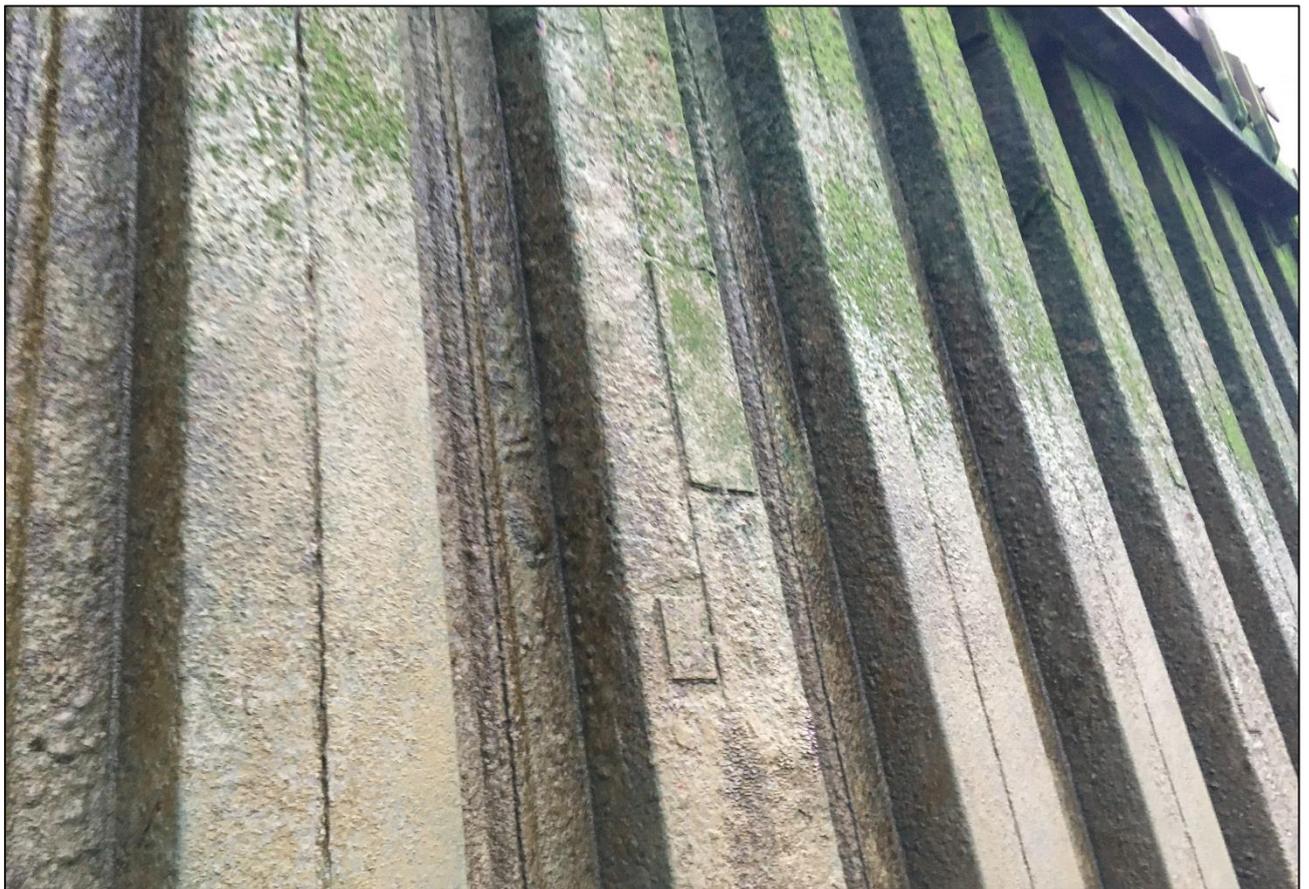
Typical patch repair to the mid level of the steel sheet pile wall, in good condition
